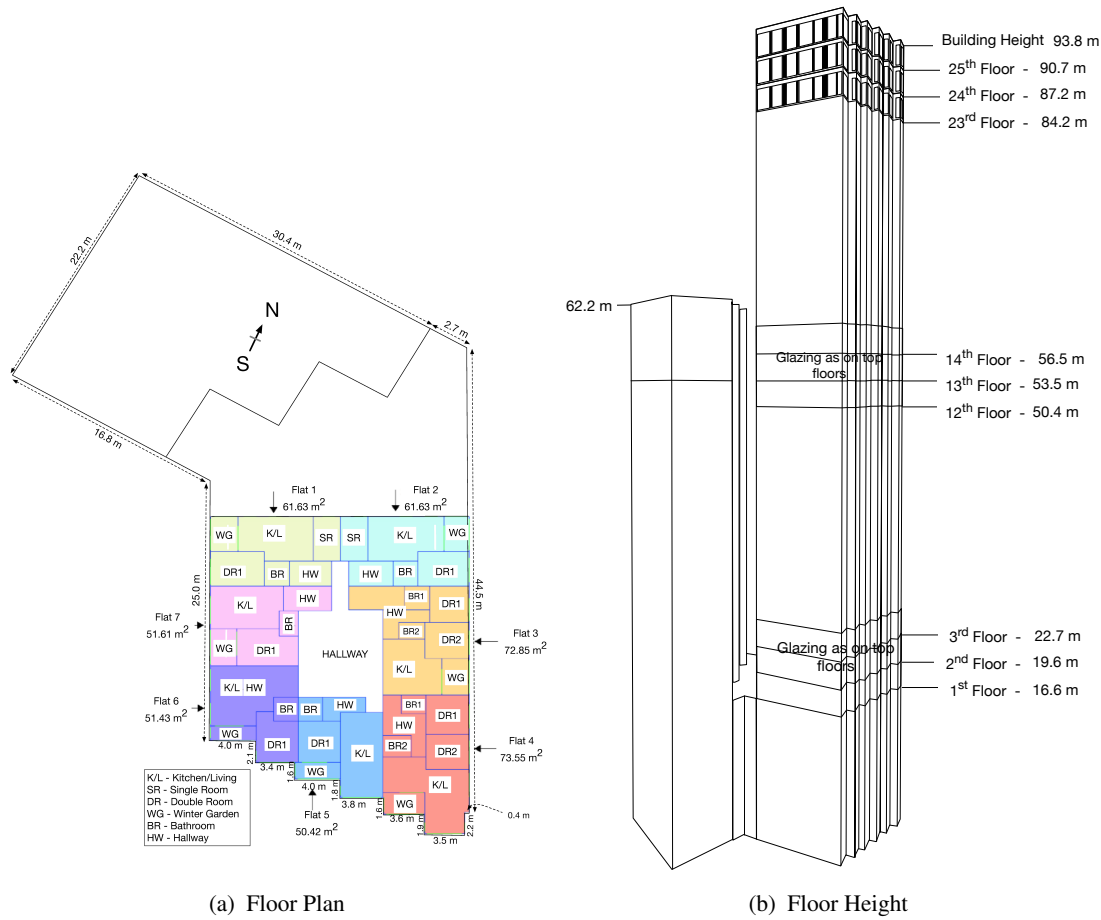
Building layout and dimensions. (a) Floor plan of the building selected for this research. Divided in seven flats that account for a total of 41 rooms per floor³⁸; (b) Building base model for 9 floors out of a 25-storey building using IES-VE. Building divided in bottom, middle and top floors.
